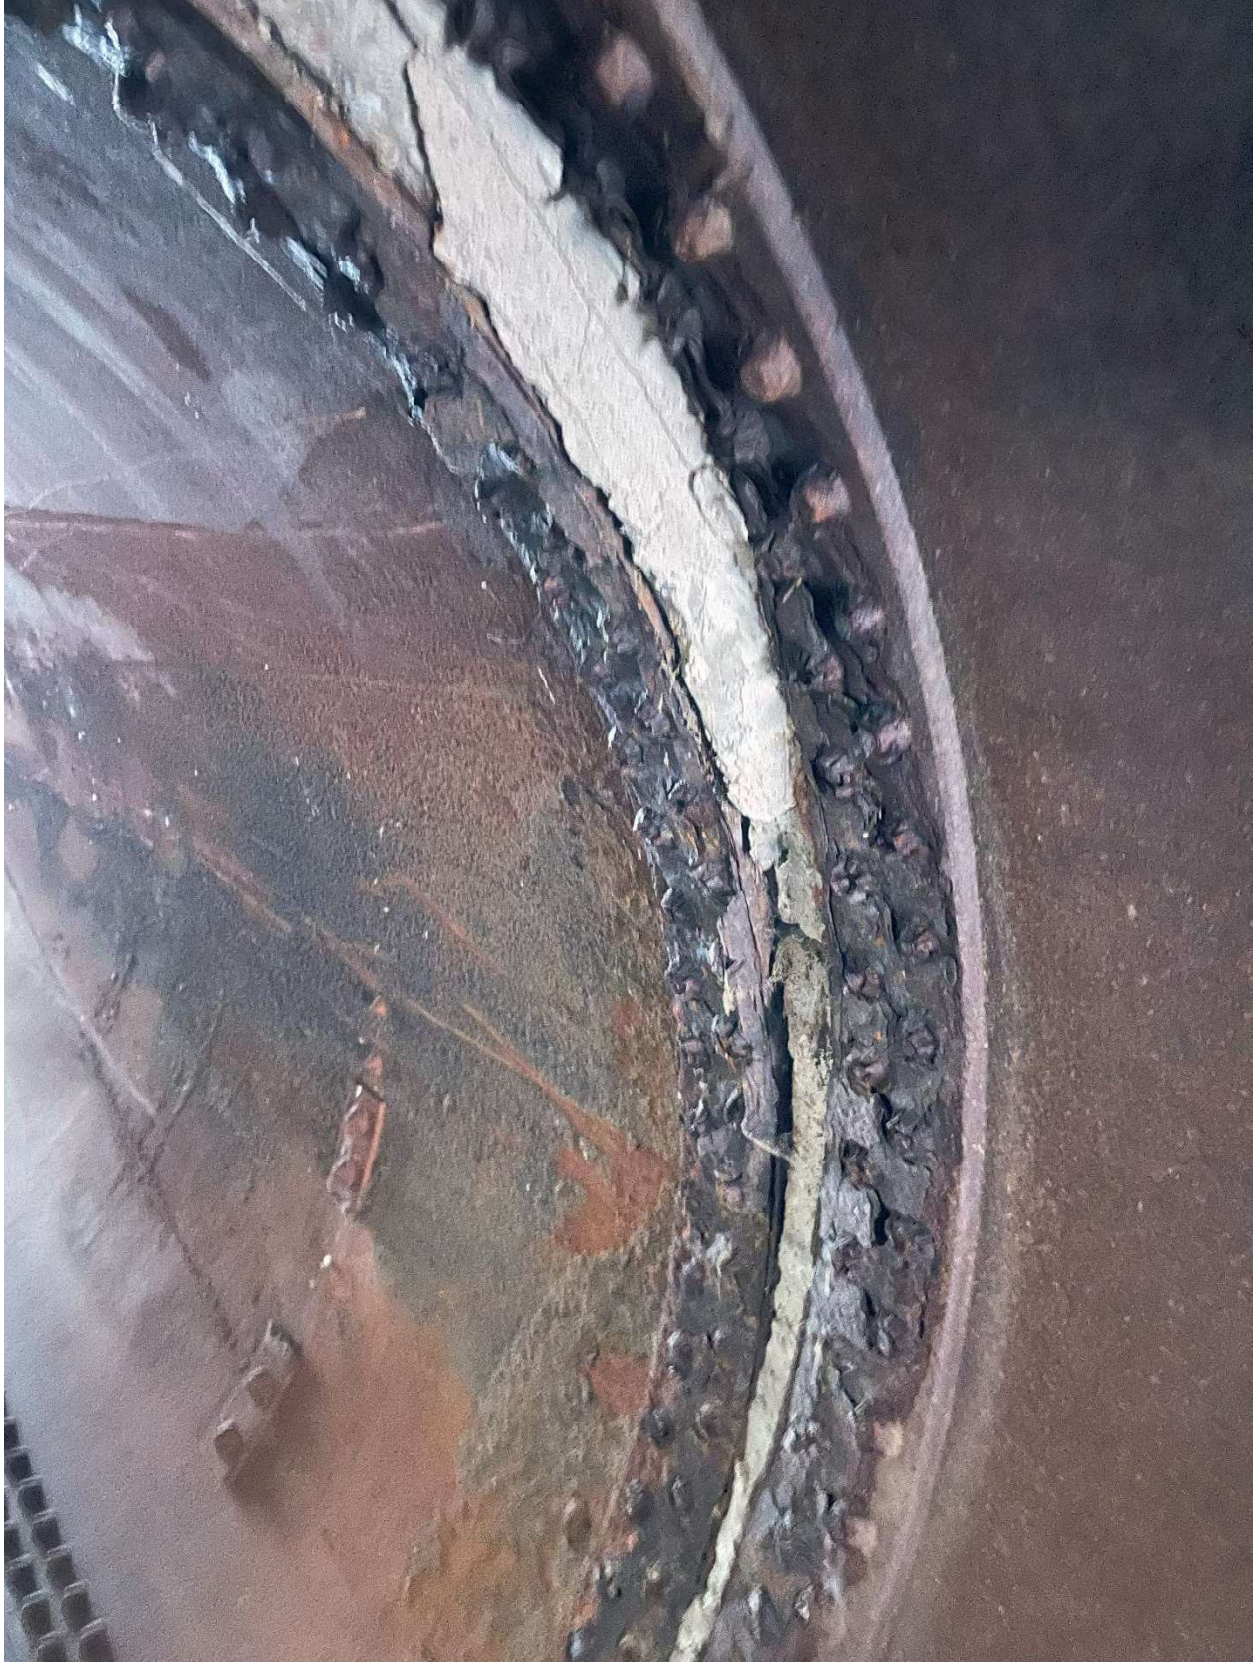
Iradell Road culvert. The rivets on the inside of the culvert are corroded and falling apart.
